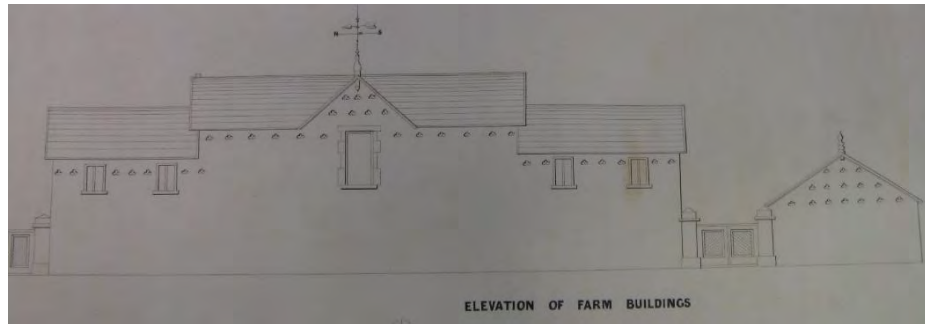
An elevation plan of the west(/road) facing agricultural buildings.¹¹³
